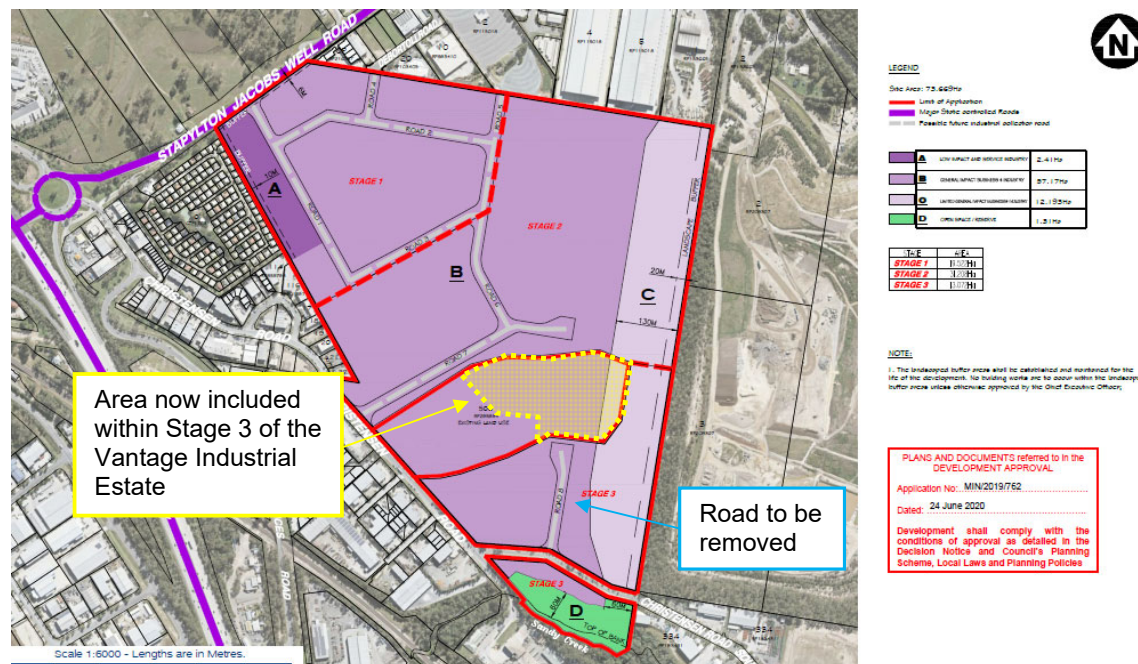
Approved Staging Plan (Source: MIN/2019/762)
